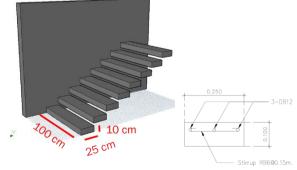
Conceptual image of RC. cantilever stairs and its steel reinforcement
